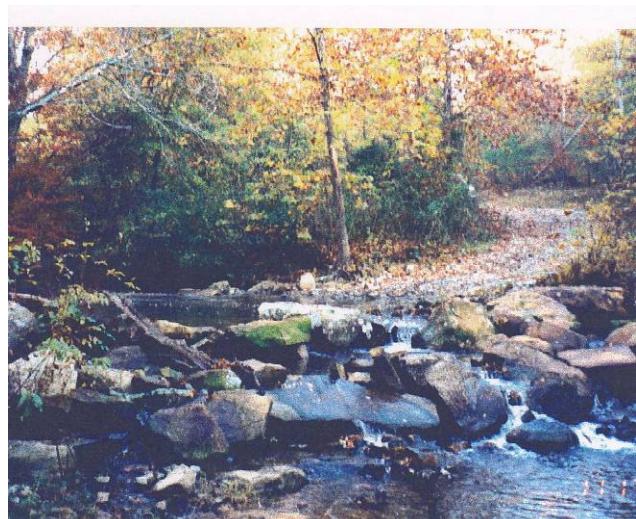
South approach to completed Caney Creek ford showing the lower end wall downstream from the roadway
